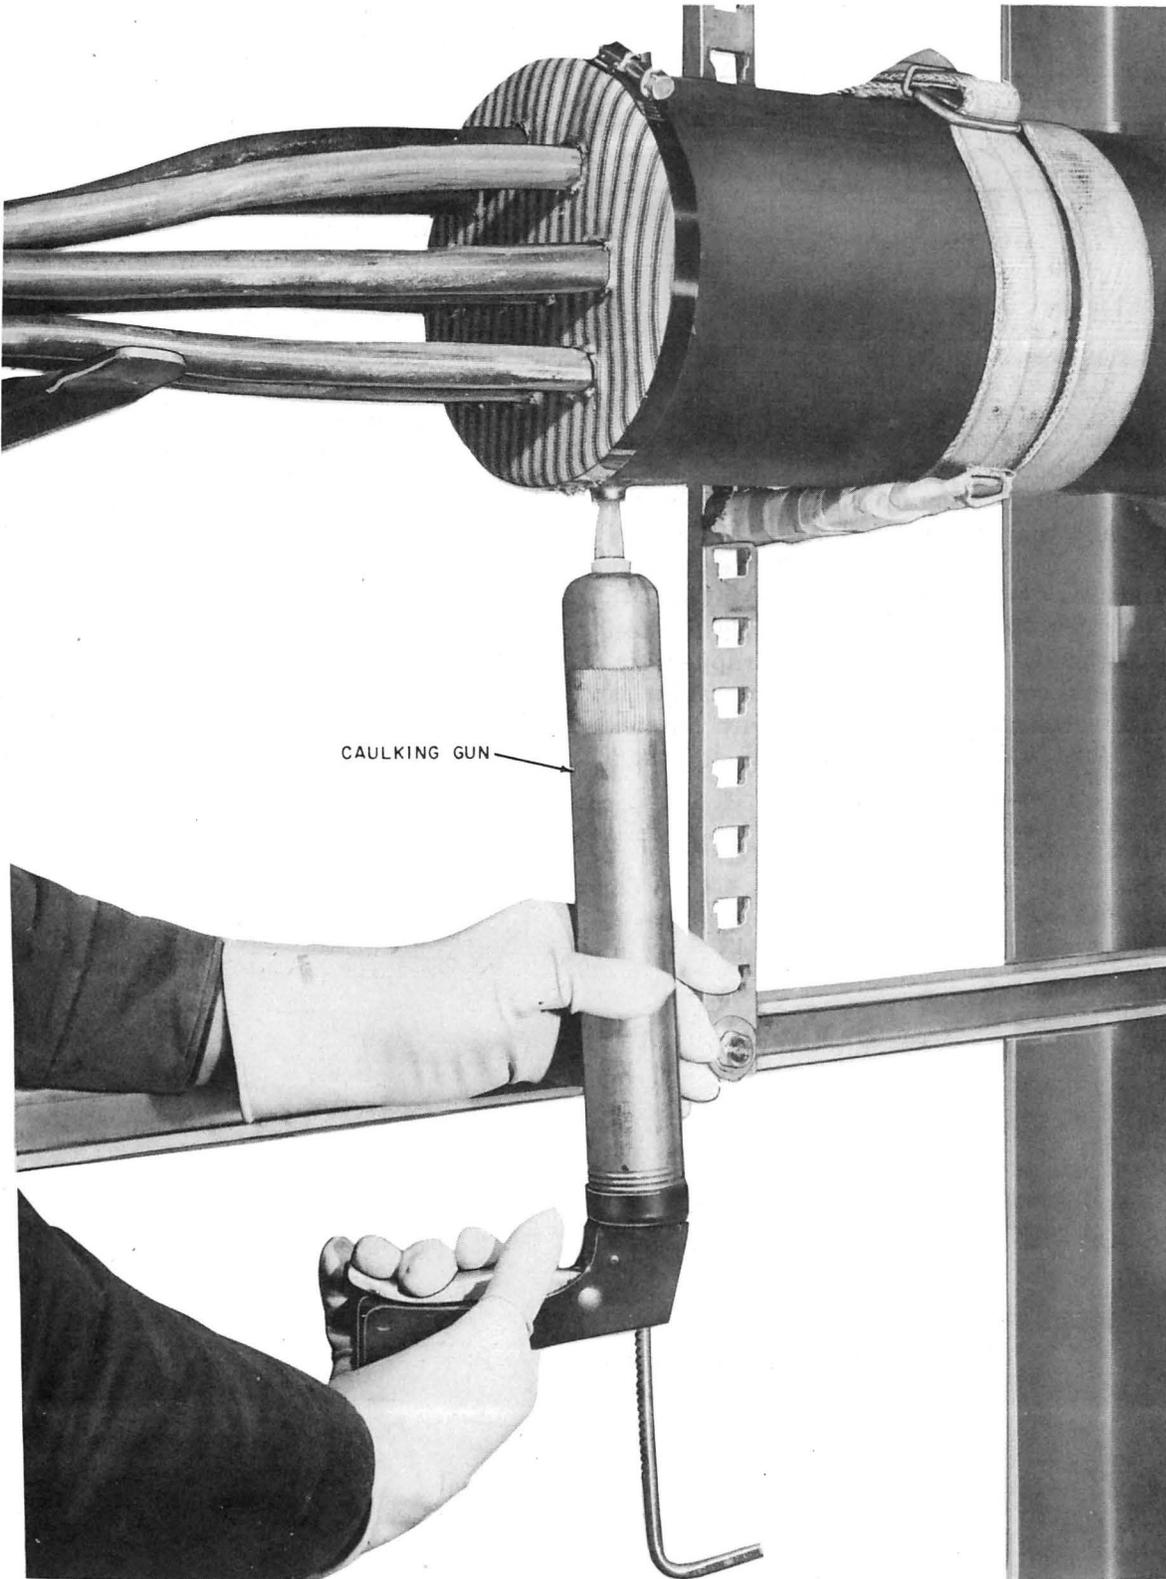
Injecting Plastic Steel Into Bottom Flange
